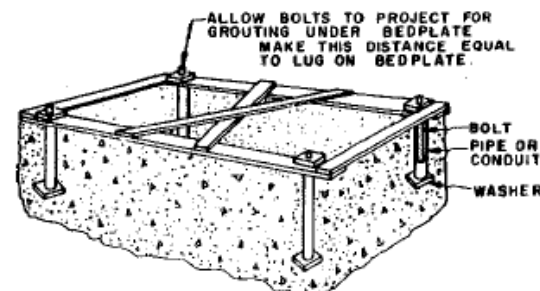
TEMPLATE FOR HANGING FOUNDATION BOLTS WHILE POURING THE FOUNDATION.
